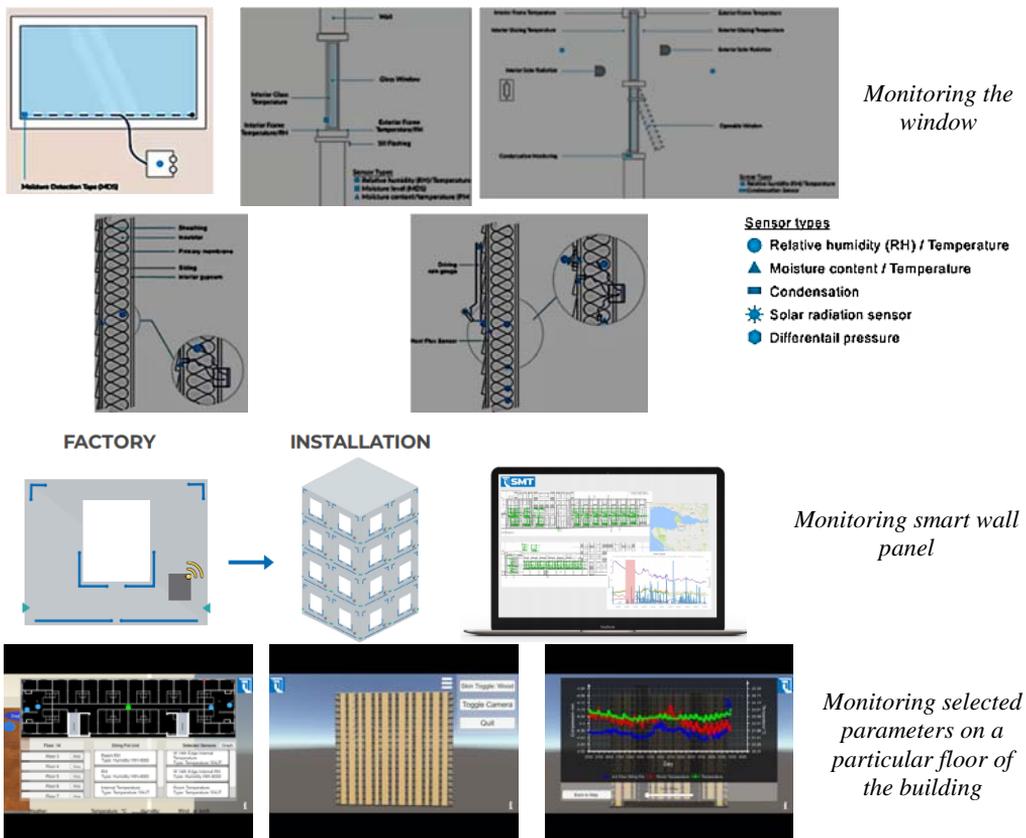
Smart monitoring components of buildings (prefabricated buildings)
